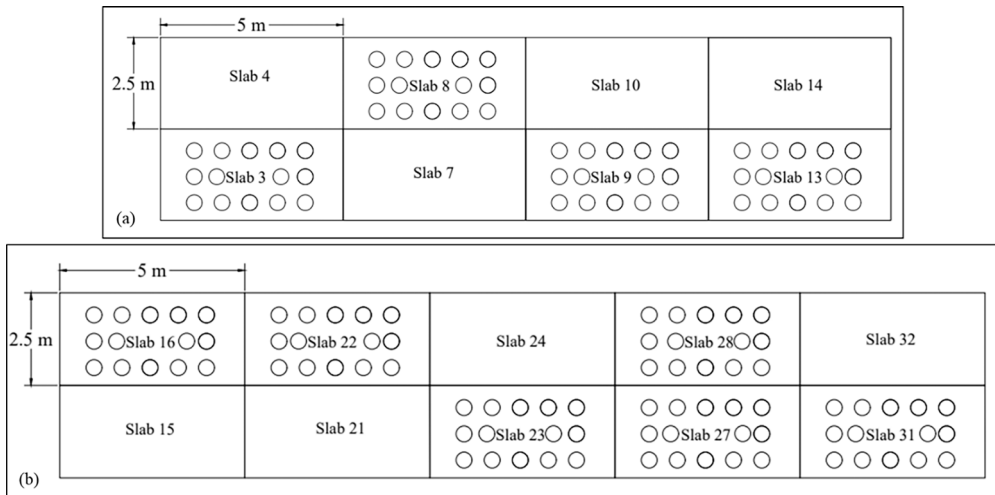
Schematic of the ravelled pervious concrete pavement slabs.
